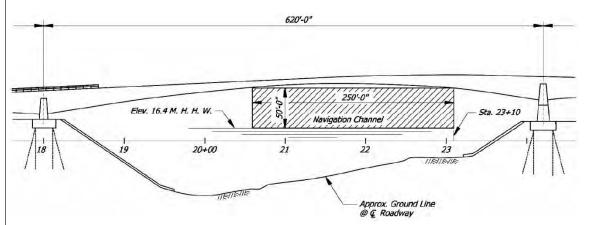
Bridge elevation view with no substructure units in the waterway. (Source: Alaska DOT)
